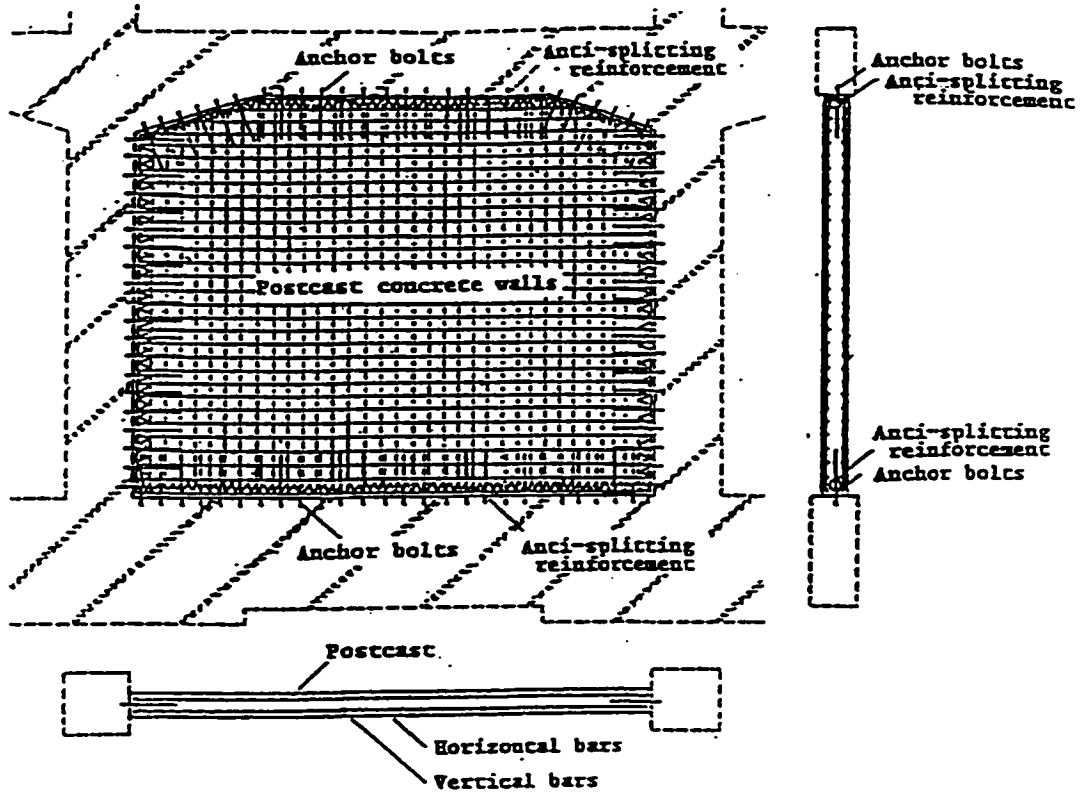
Method of erection of postcast concrete shear wall (Aoyama, 1986).
